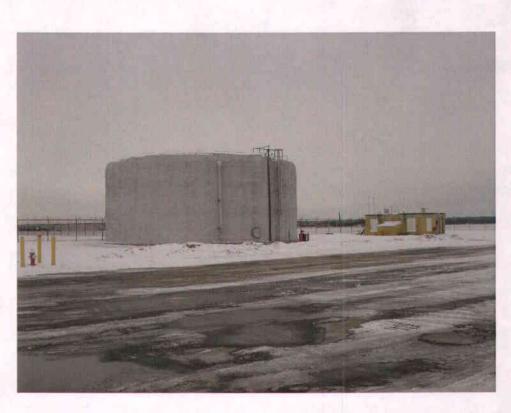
AFP 85: Building 26 (pump house) [FRA-8380-12] and storage tank.
